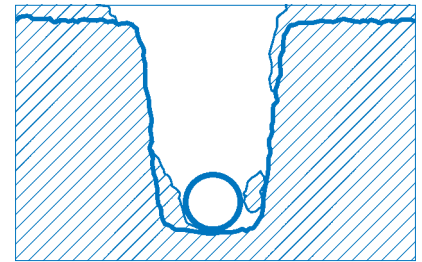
The use of pipelines with integrated protective layers is recommended when dispensing with a sand bed.
